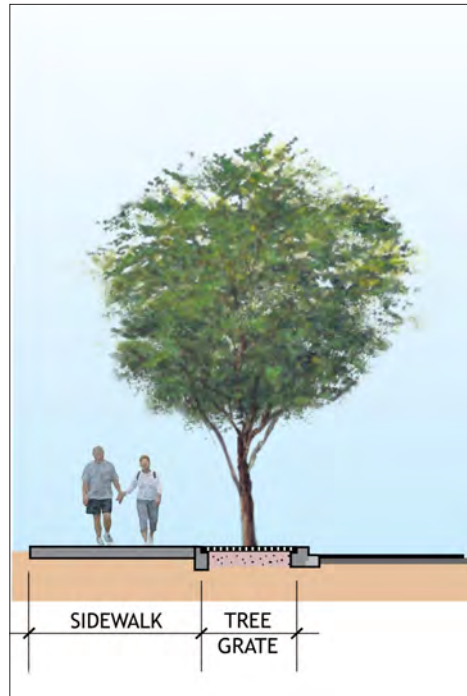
l: TYPE 2 - Sidewalk and trees in grates.
